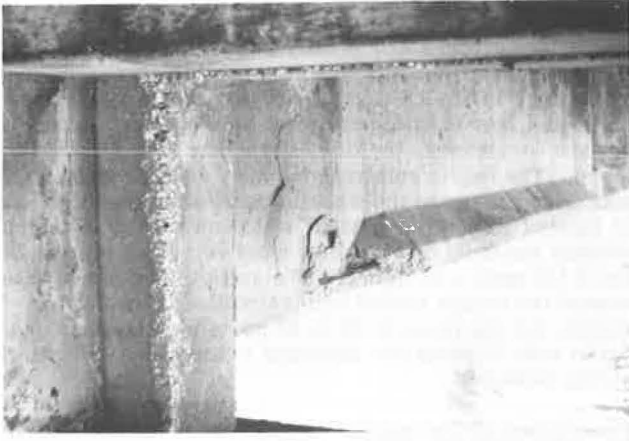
Exposed and corroded prestressing bar in girder lower flange; lower bar is tie bar from end block.
